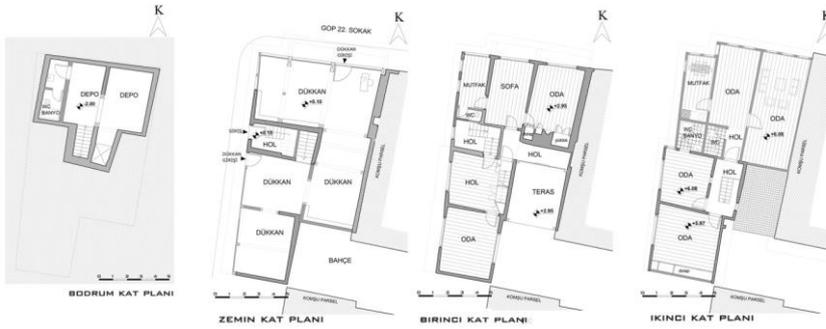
The restoration plan of the traditional house at block 135, lot 75 (*Yaprak Mimarlık Office archive*)
